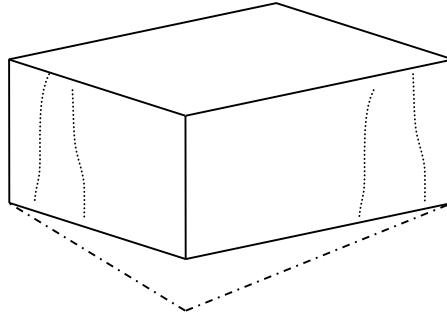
Settlement cracks in the wall of the building (Source: TARU Analysis, 2013)
